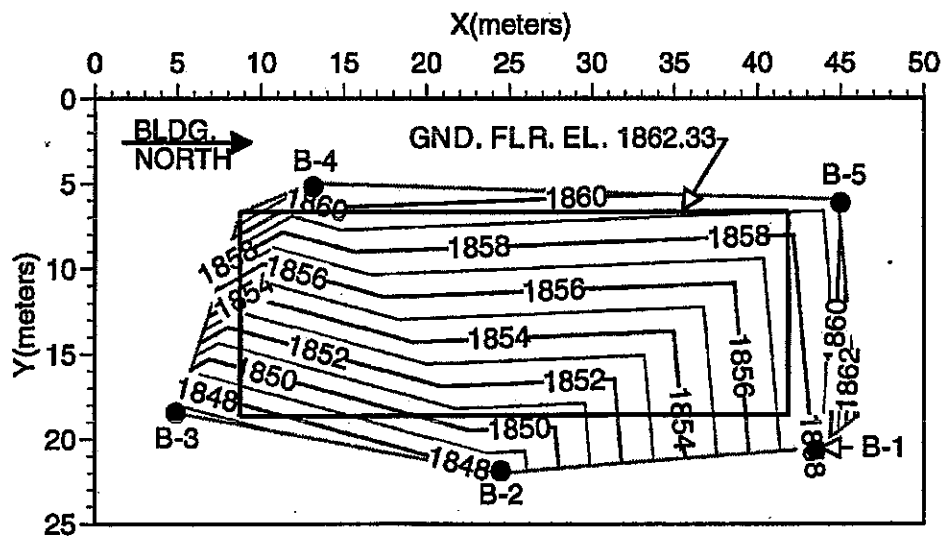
Plan of Borings and Estimated Top of Rock Elevations in Meters
